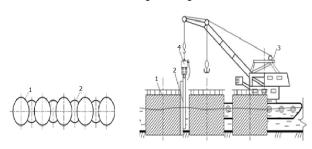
Diagram of the joints between the steel shells, made with the use of sheet piles:
